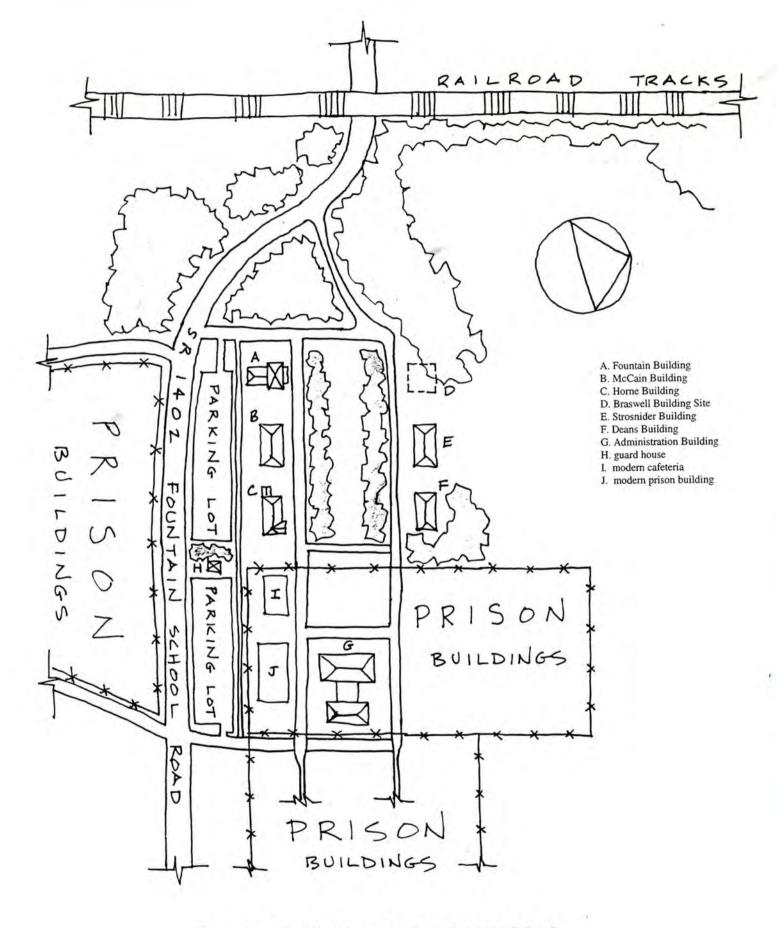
East Carolina Industrial Training School Site Plan Not to Scale
